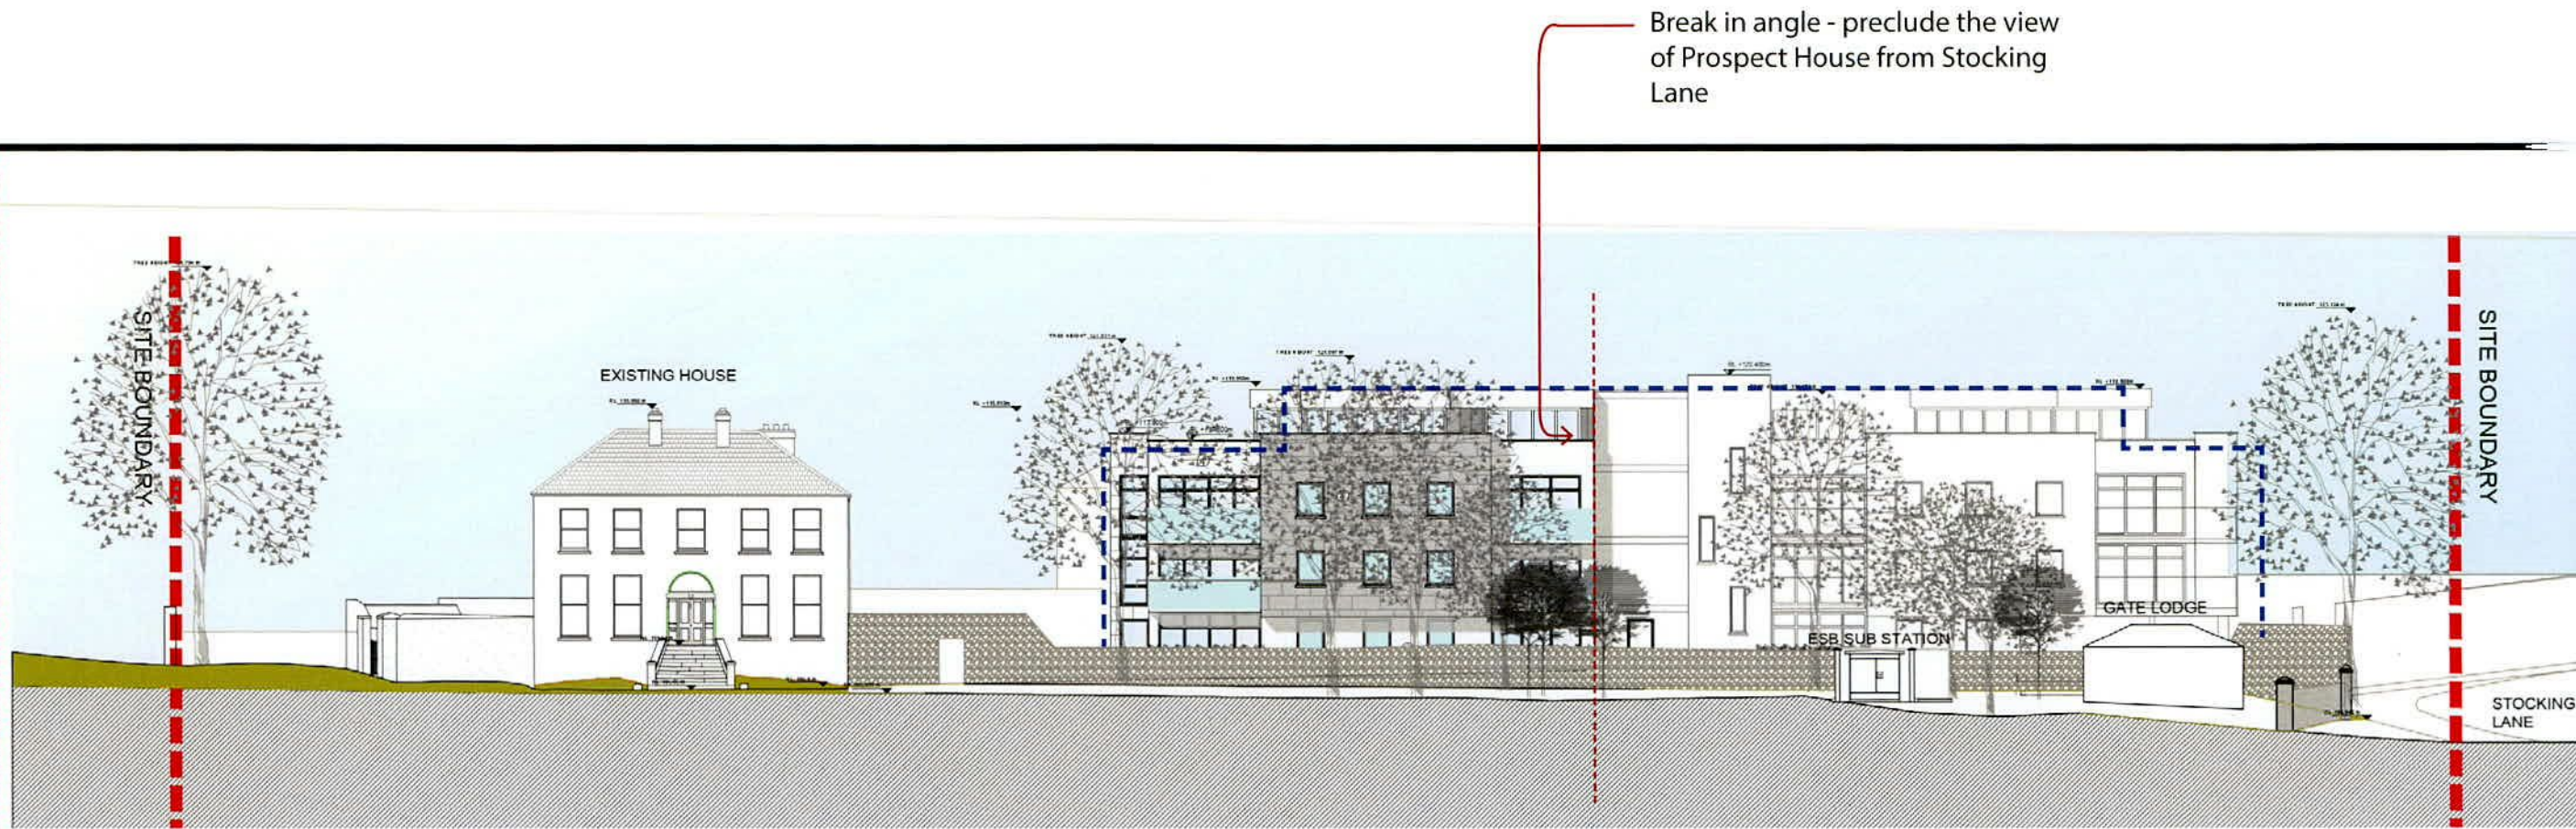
IMAGE : Site Section of Previous Refused Application - Prospect House + Block of Apartments
